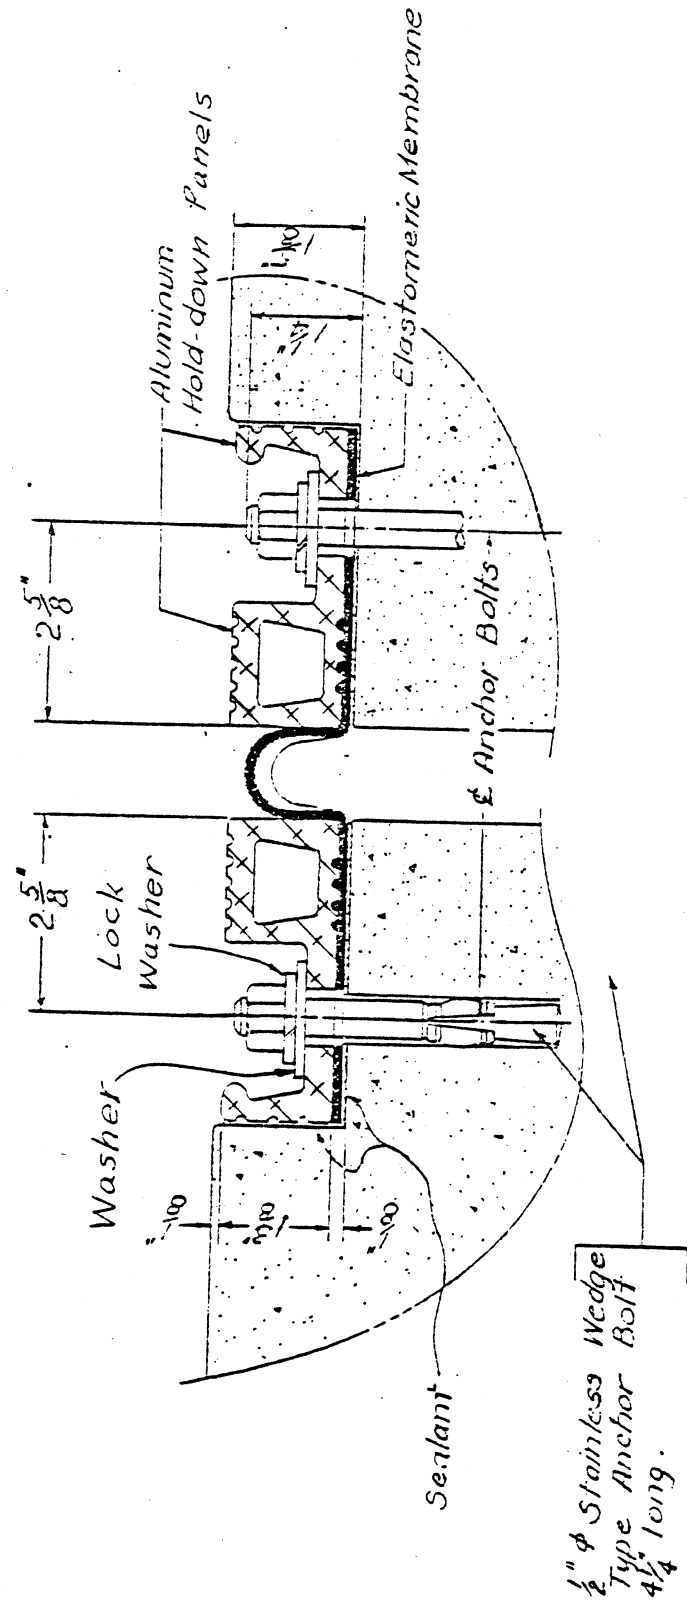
Typical section through the ON-FLEX 25 bridge deck expansion joint showing wedge type anchor bolt. 1 in. = 2.54 cm.
